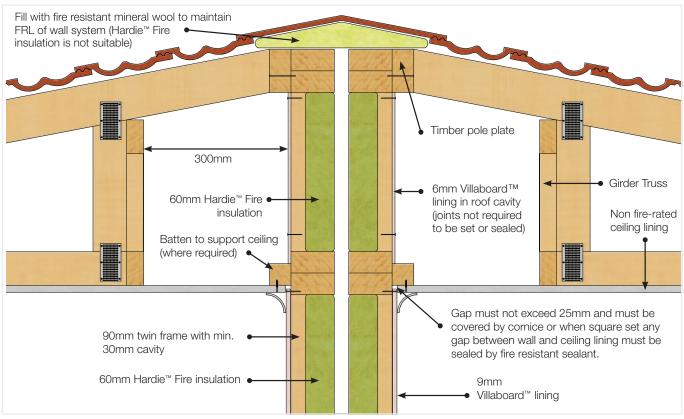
HARDIE™ SMART INTERTENANCY WALL SYSTEM WITH PARALLEL GIRDER TRUSS WITH ACCESS
